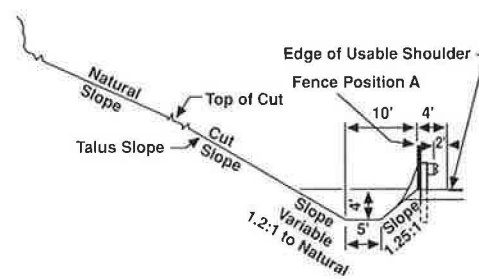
Roadway section on talus slope—Design B, fence position A.
